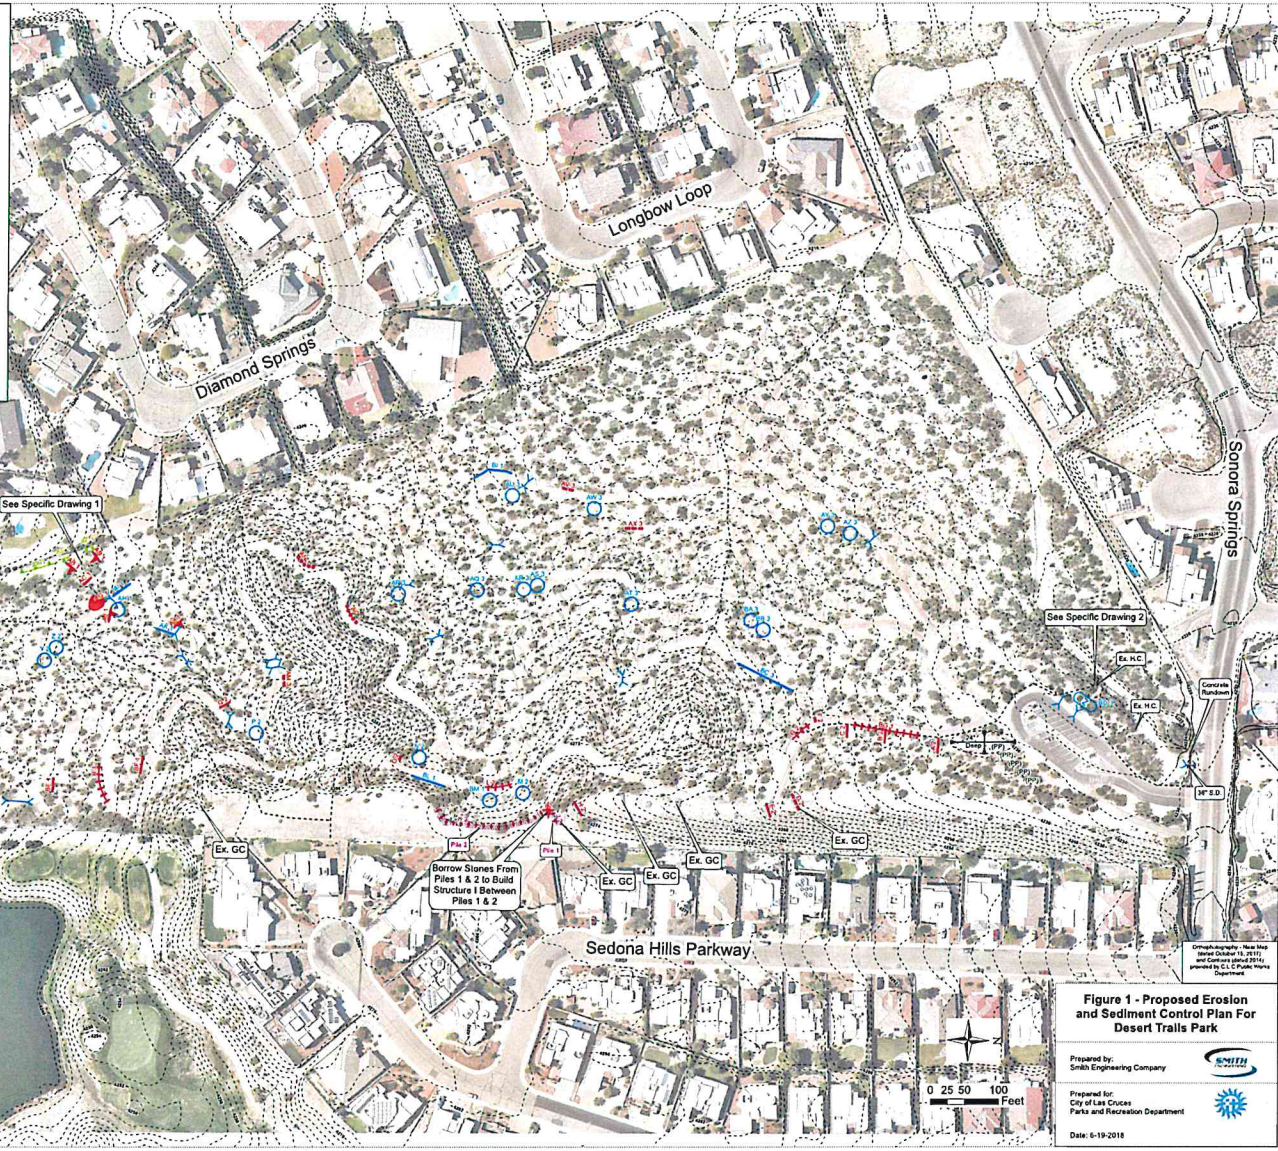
Proposed Erosion and Sediment Control Plan For Desert Trails Park
